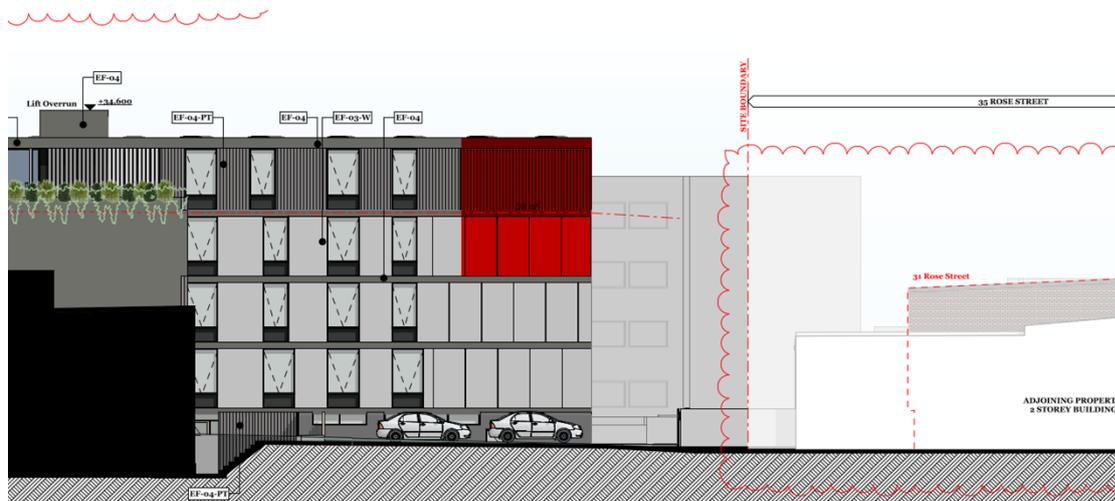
The south elevation and the relationship to the adjacent terrace dwellings, with the setback area shown in red.
